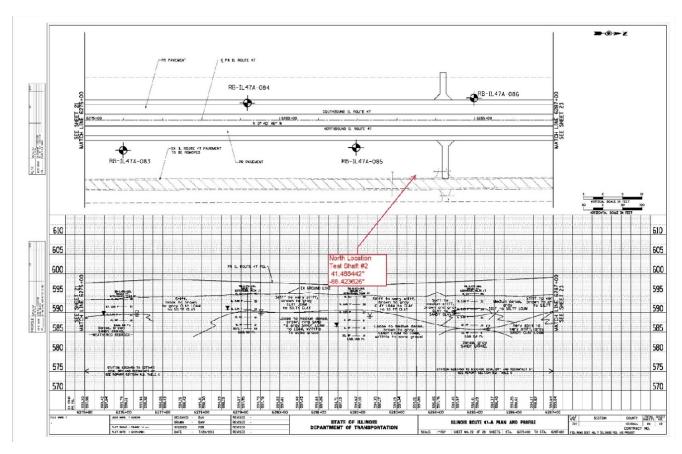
Illustration. Plan view of test drilled shaft #2 site location.
